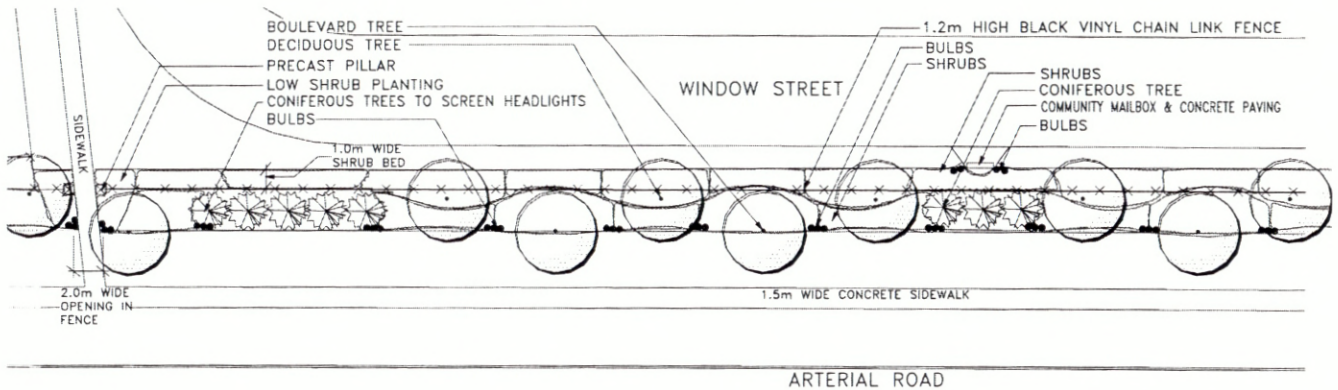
PLAN OF WINDOW STREET BUFFER
